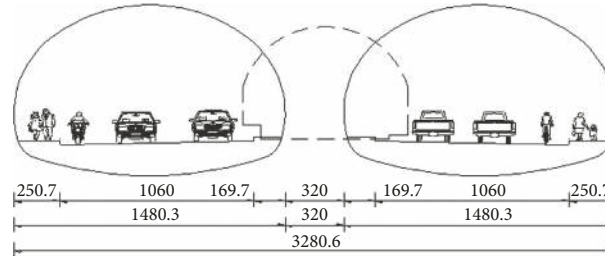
Cross section of the reconstructed and expanded tunnel unit (mm).
